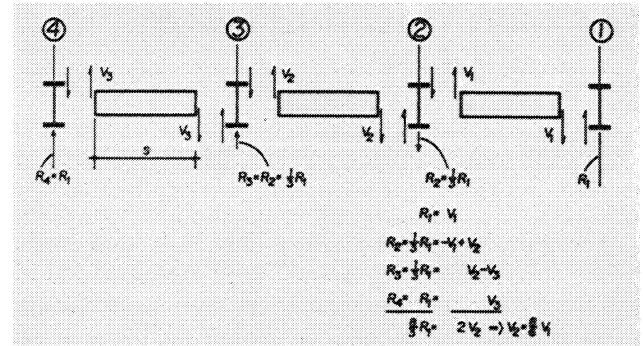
Cross-section of a four-girder bridge—shear equilibrium
